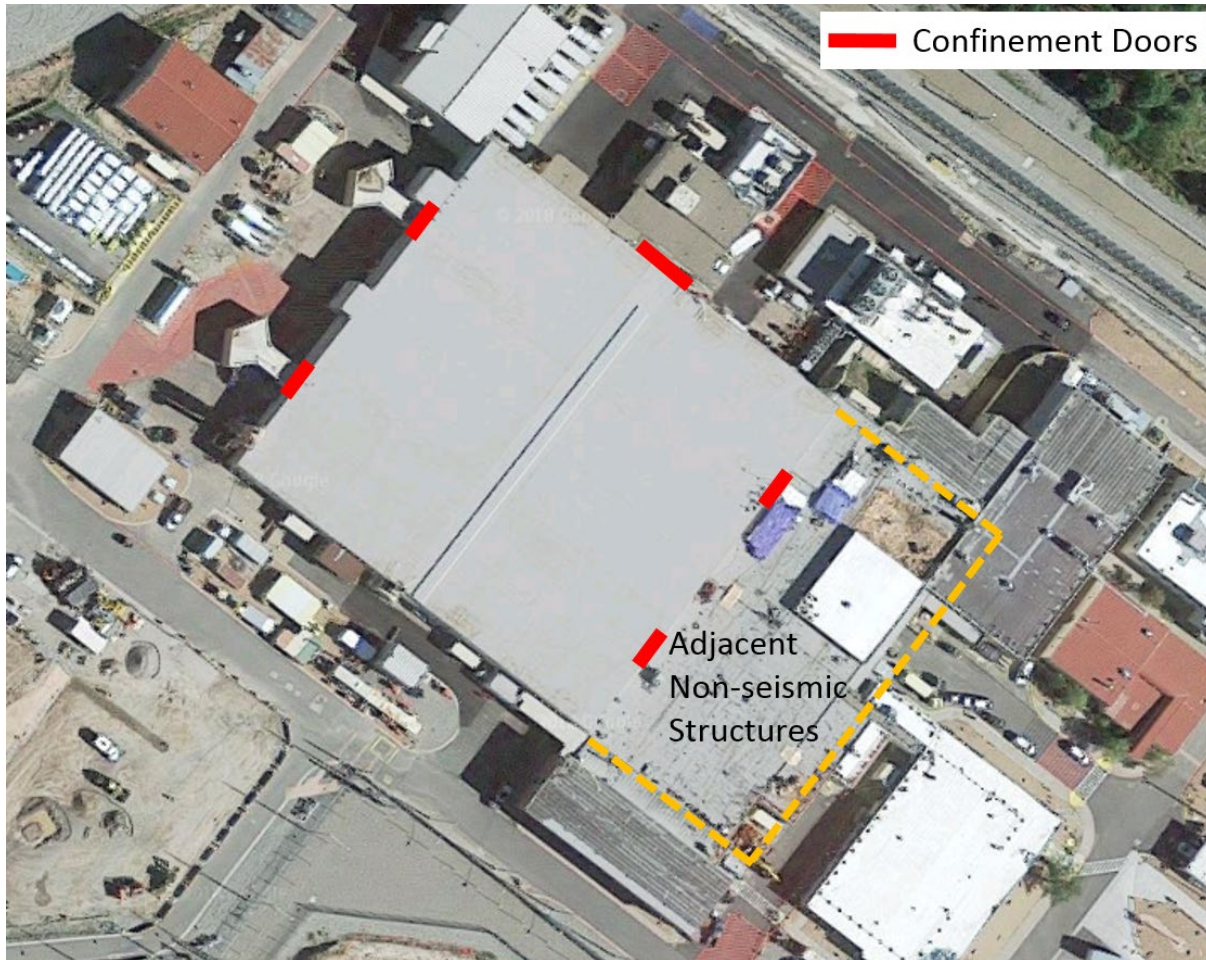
Layout of PF-4 showing overhead facility view and exterior confinement doors.
